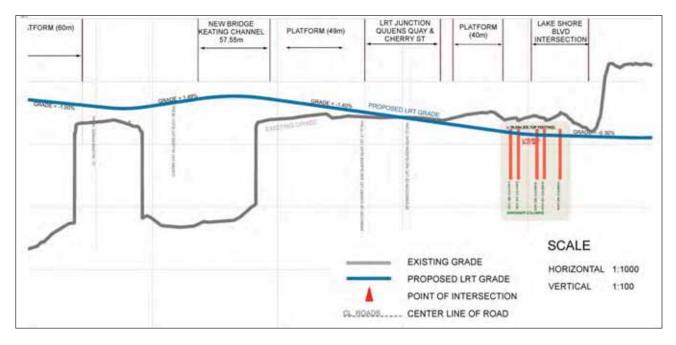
Cherry Street Road Vertical Profile Alternative 2
